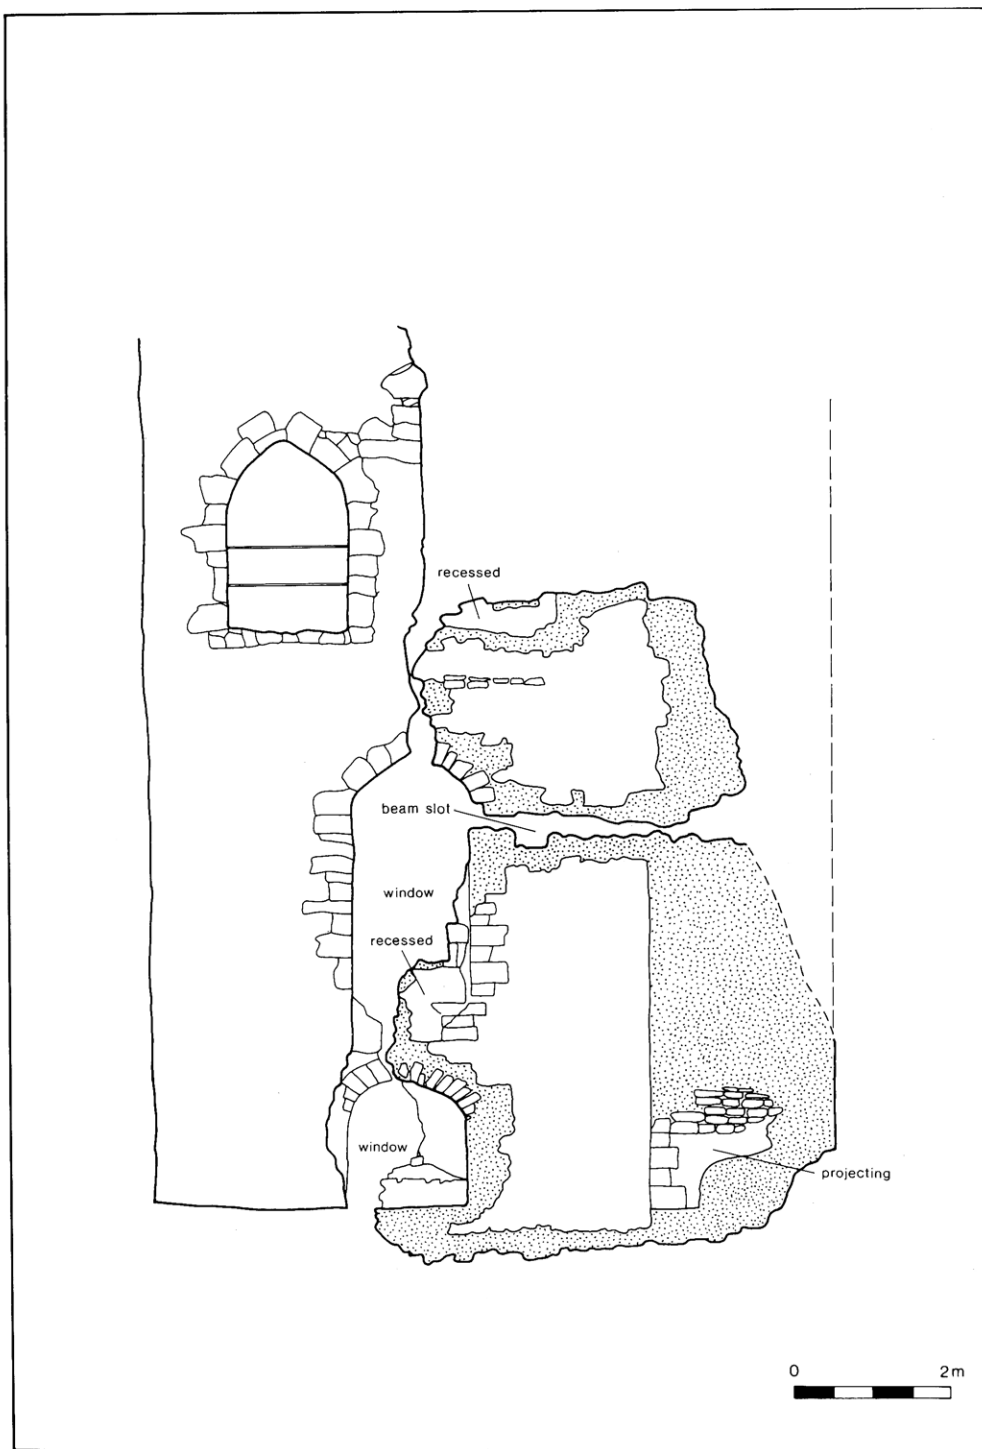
Partial reconstruction of the north wall of the keep (internal).
